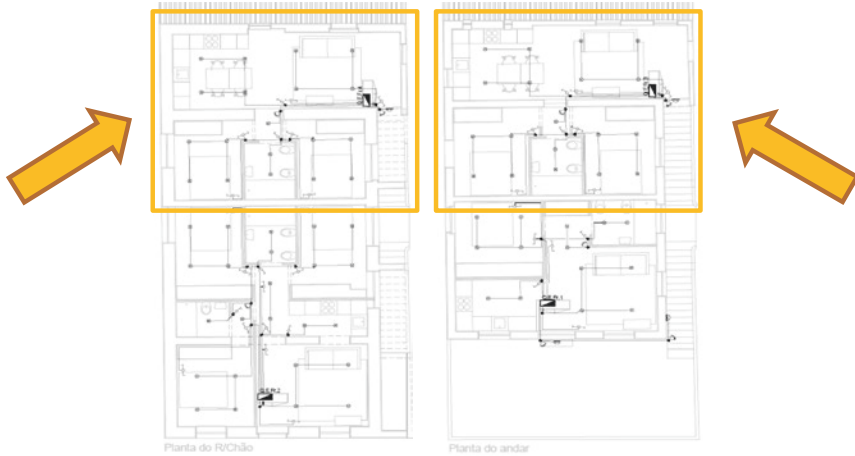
Indication of the T2 apartments, one on the lower floor and another on the upper floor of the building. (Source: GAIURB, 2022)
